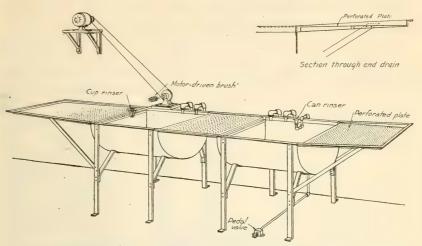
Sinks in sterilizing room, showing arrangement of cup rinser, motor-driven brush, drains, and can rinser with pedal valve attachment.
